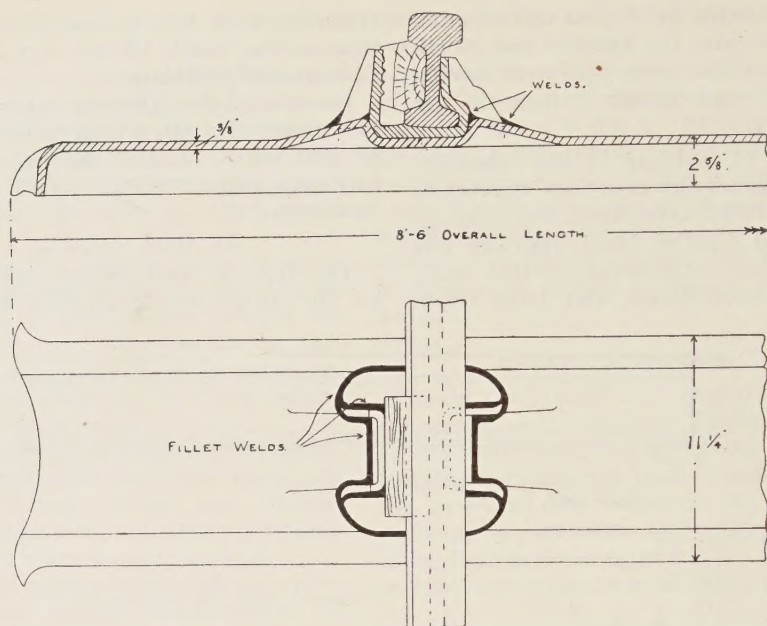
Welded steel sleeper. — Southern Railway (Gt. Bn.).
